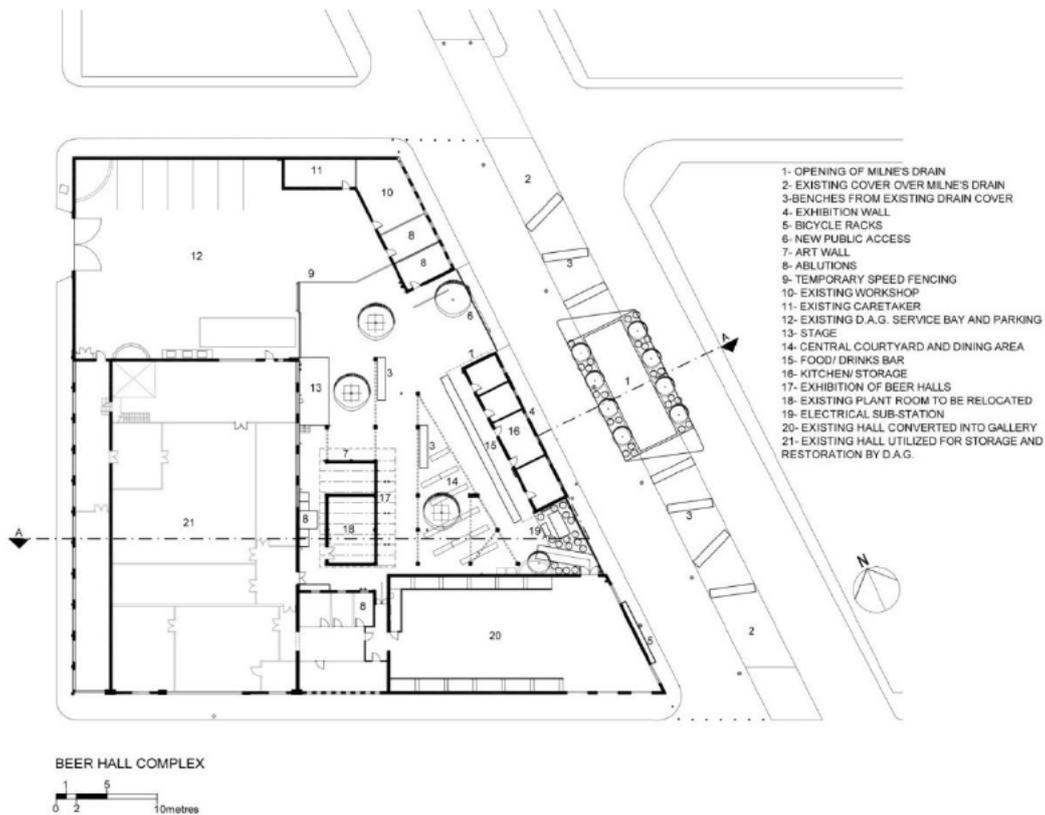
Floor plan of the changes implemented for the UIA 2014.
